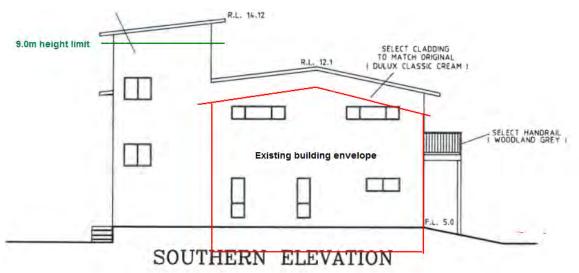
Southern Elevation depicting existing envelope, proposed additions and 9.0m height limit
